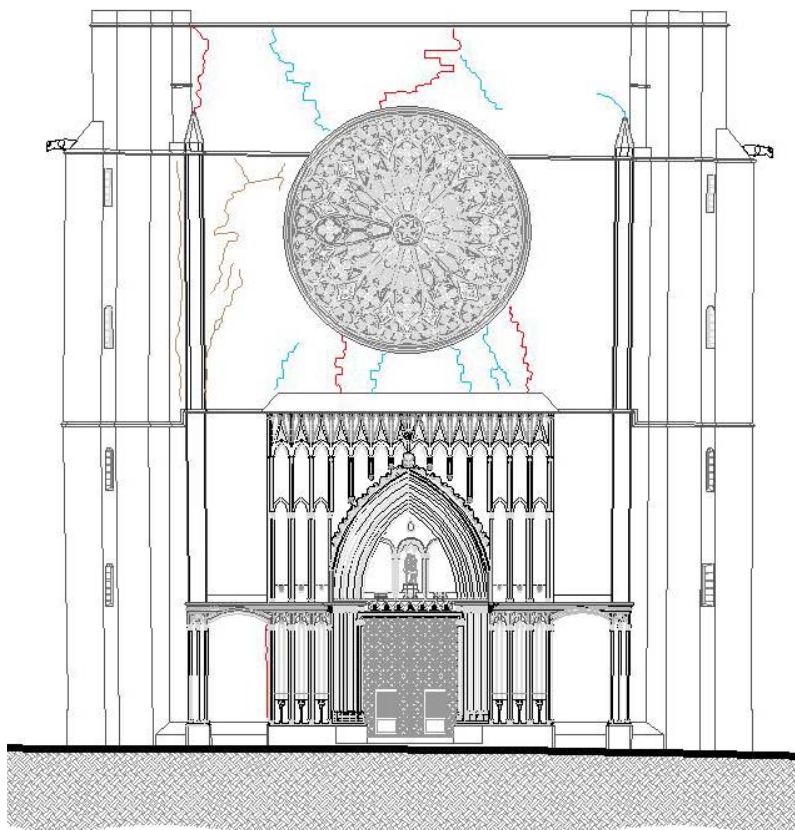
The damage of the front façade of Santa Maria Del Pi
